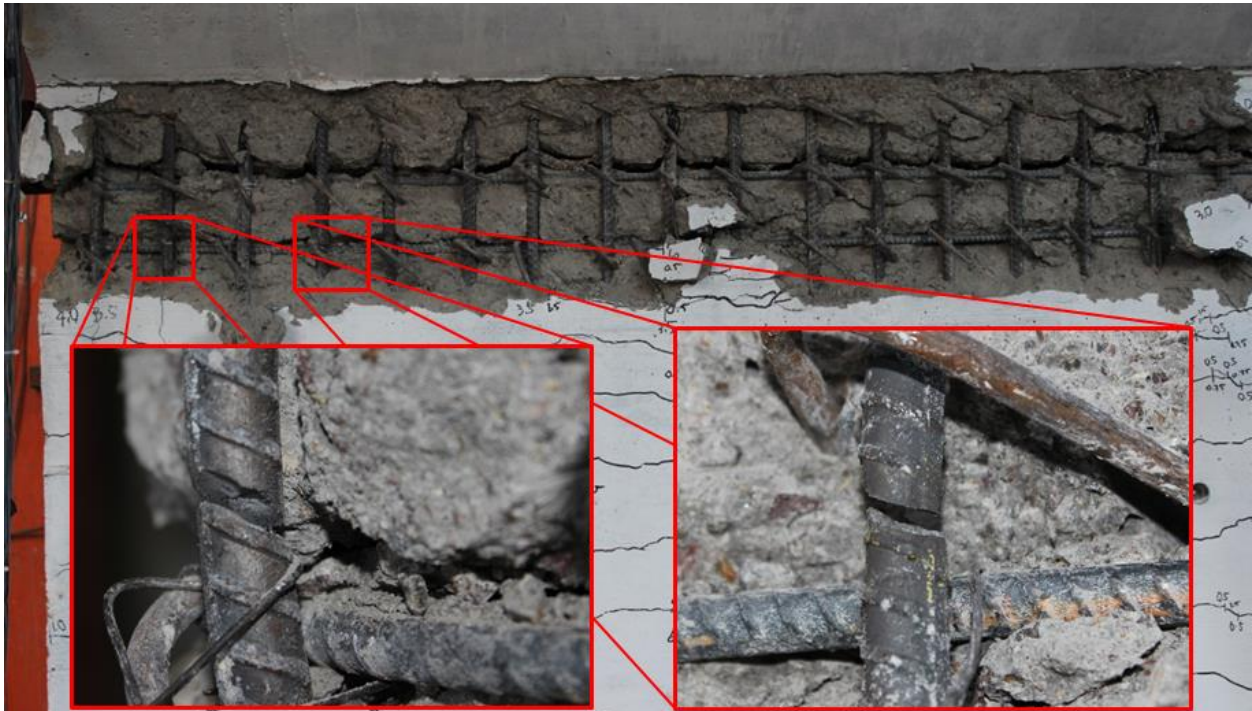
Bar Ruptures and significant concrete spalling at roof/south wall interface during positive extension at 8.0% drift ratio (Cycle 27-28). Picture of inside South wall at roof looking South.
